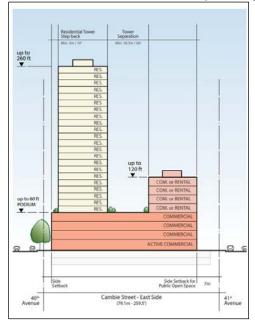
Area D: 40th to 41st Avenue (Looking East)
